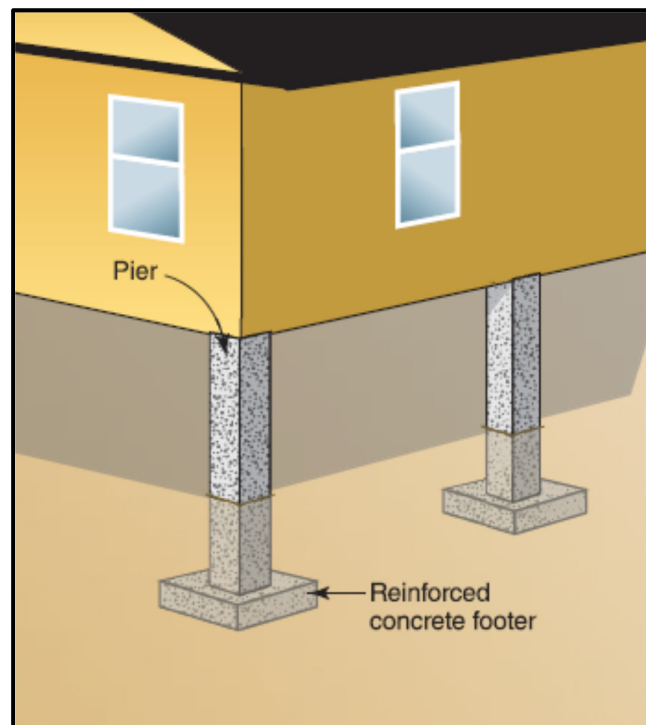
Pier Foundation (source: FEMA Homeowner's Guide to Retrofitting)
